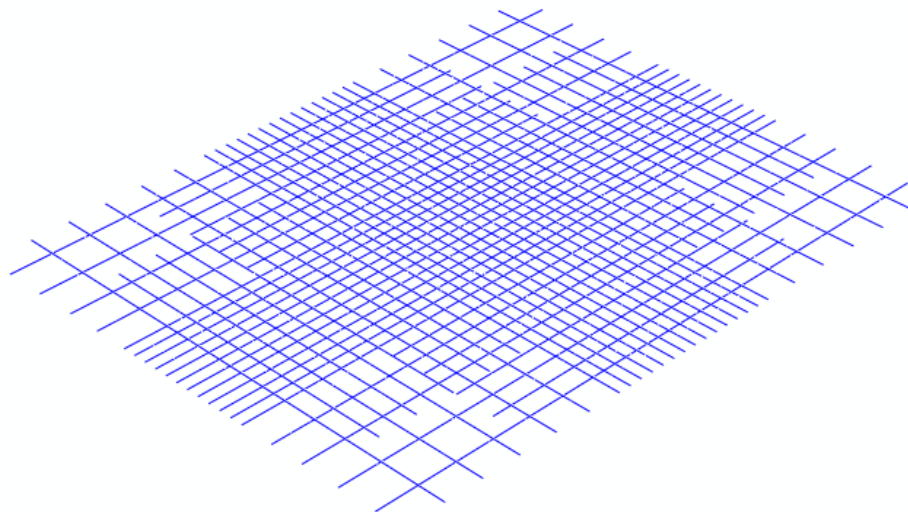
Typical top bar reinforcement for YL-L1 slabs
